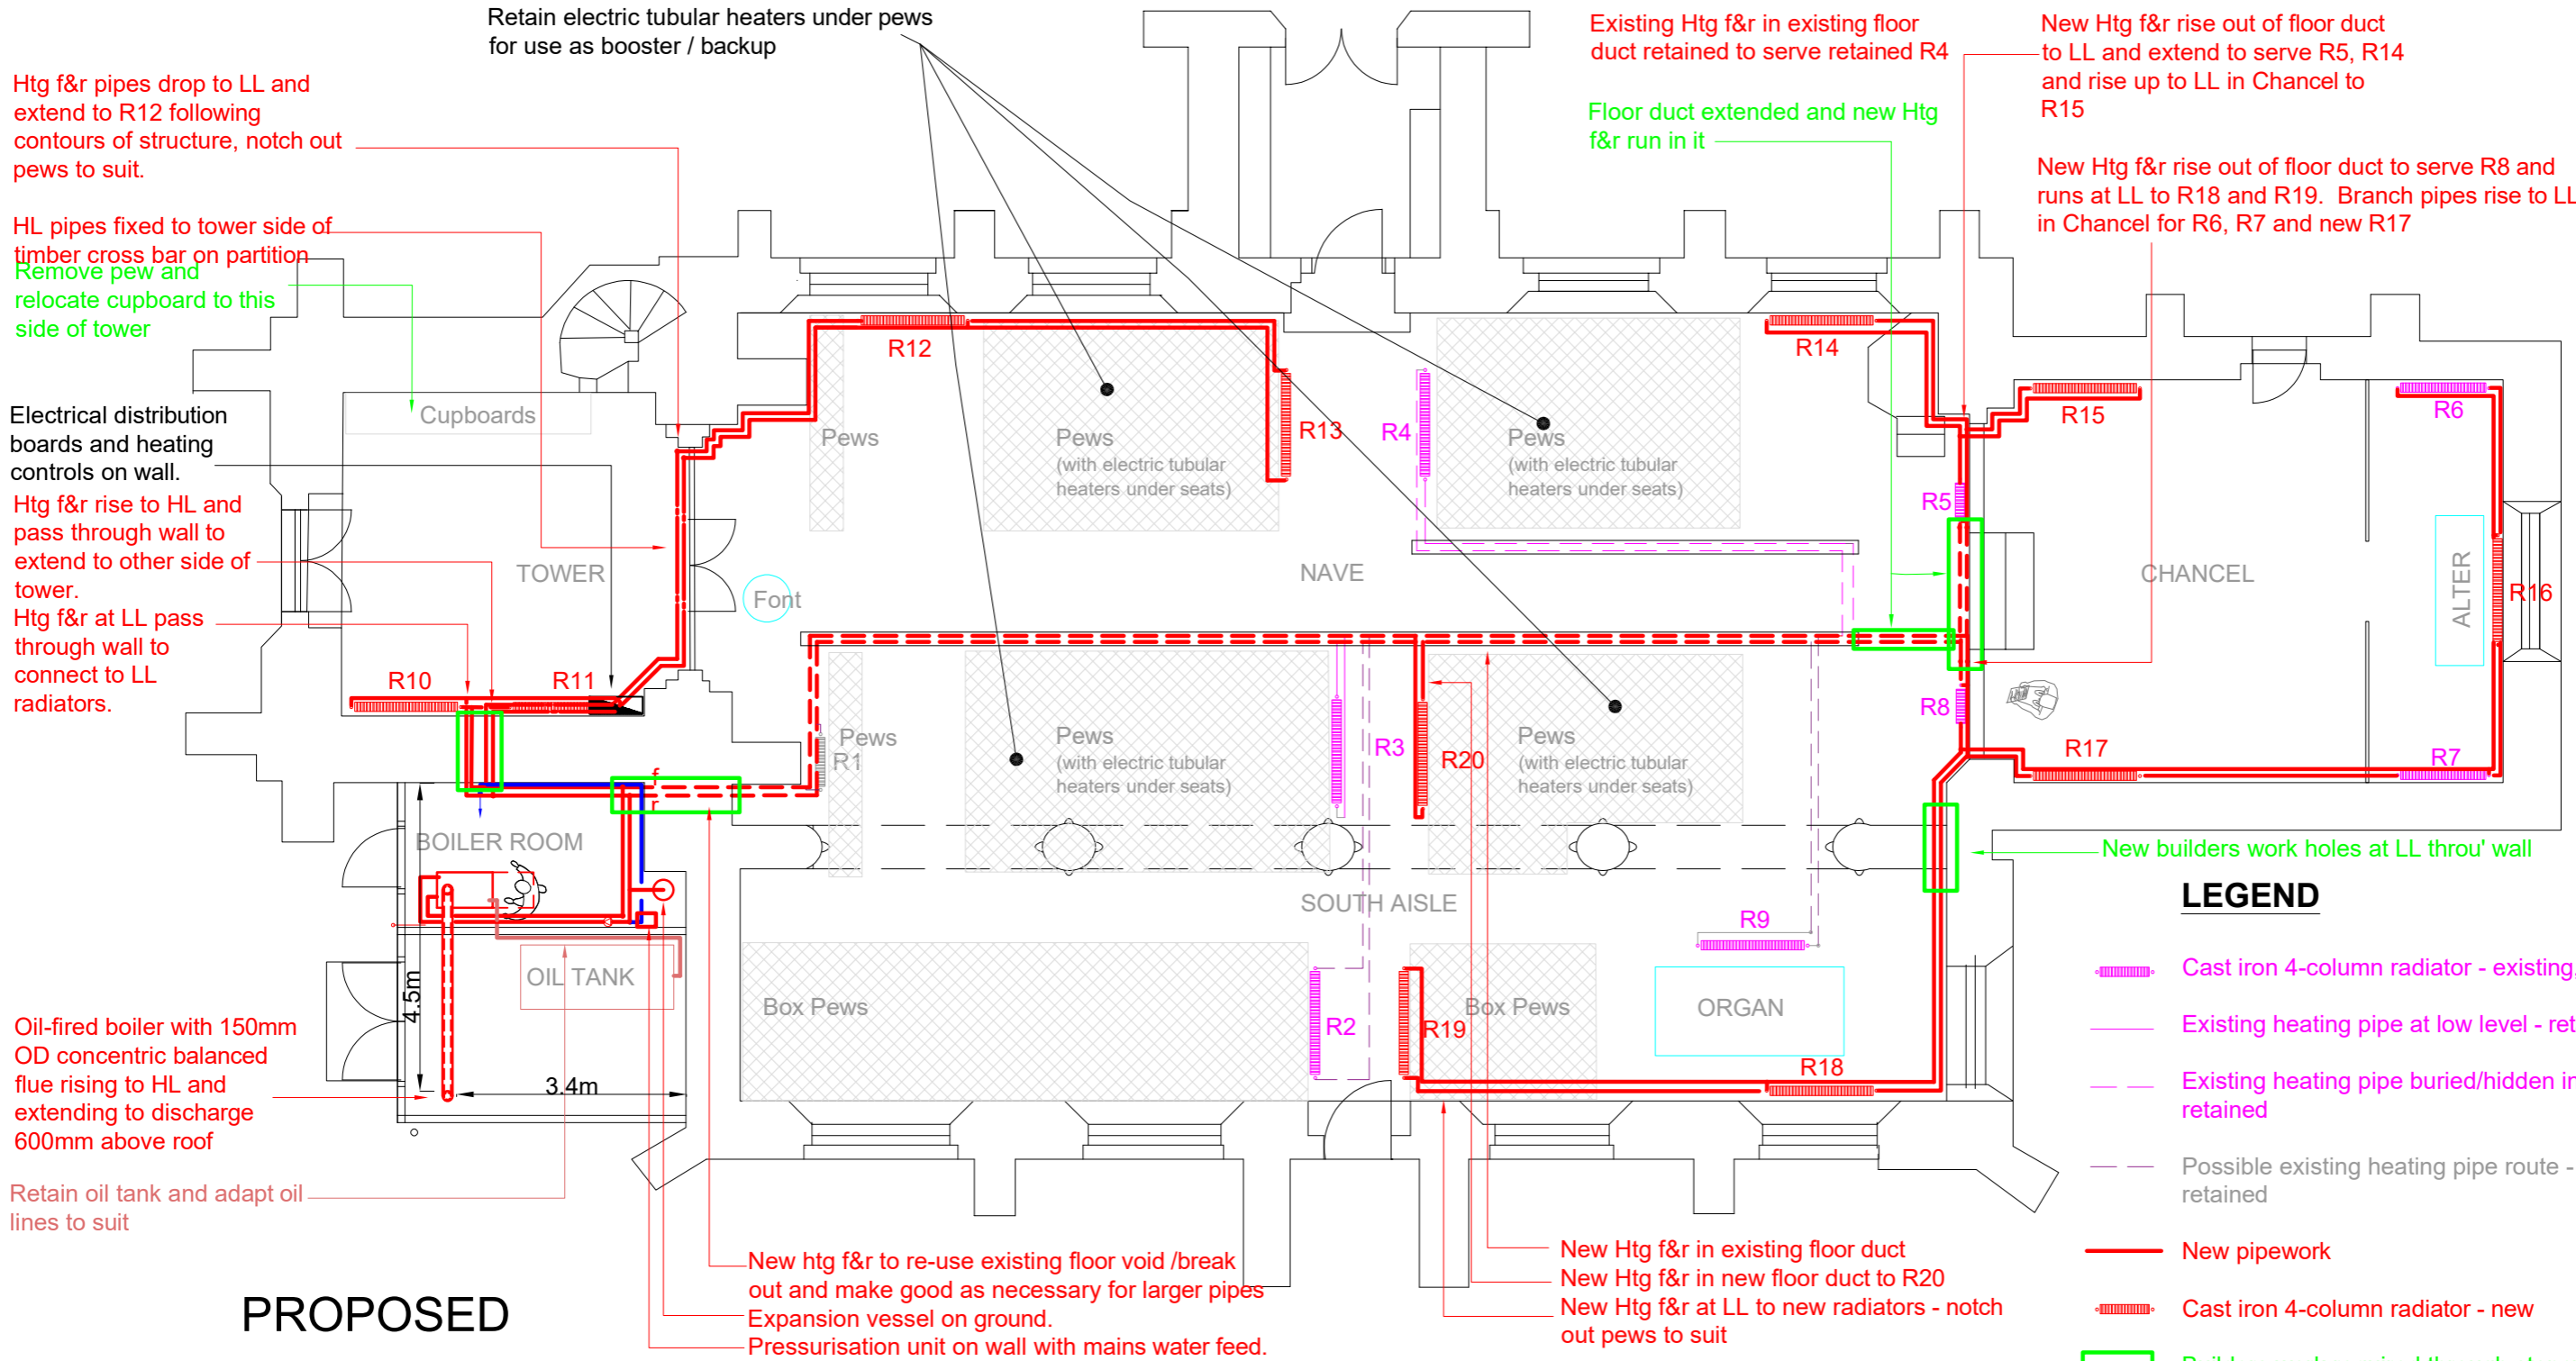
/M/02/P1 – Proposed Oil-fired Heating Layout with
